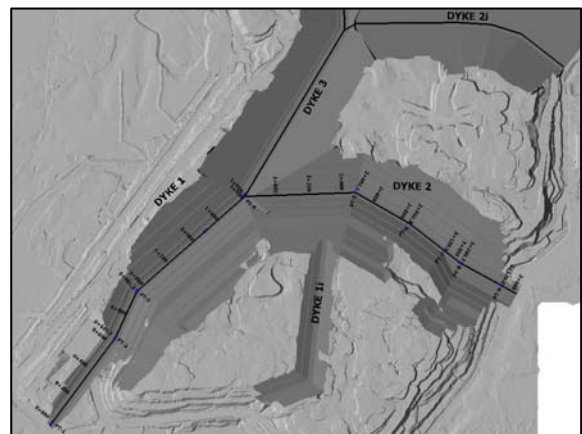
In pit tailings storage cells formed by dykes and pit walls.
